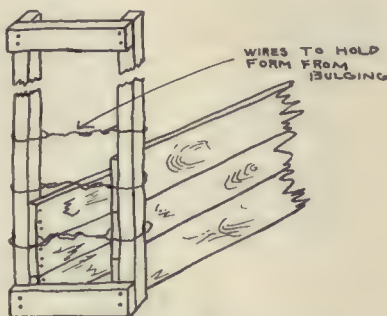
METHOD OF PREPARING FORM FOR CONCRETE WALL.
